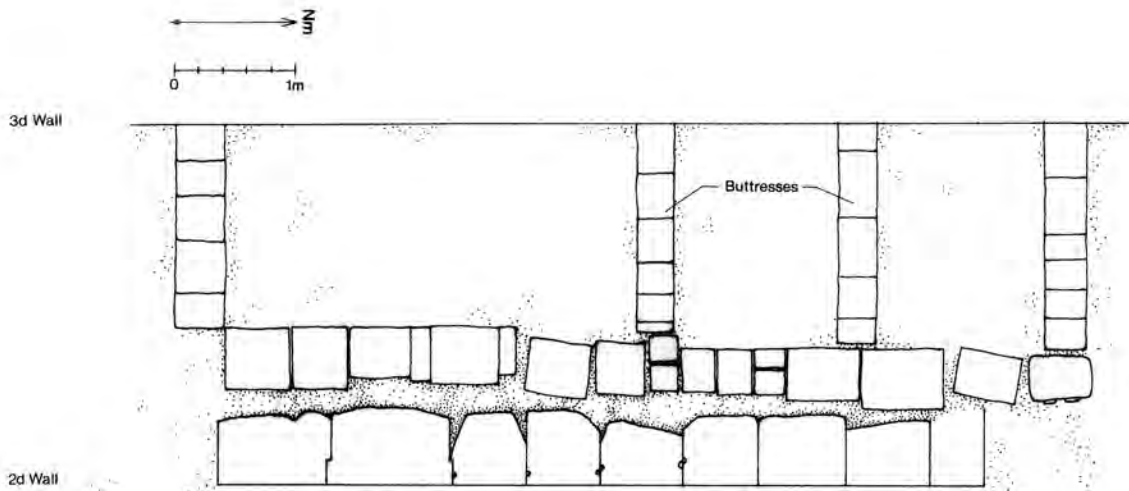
Plan of second and third walls (drawing by Jean-Pierre Protzen).
